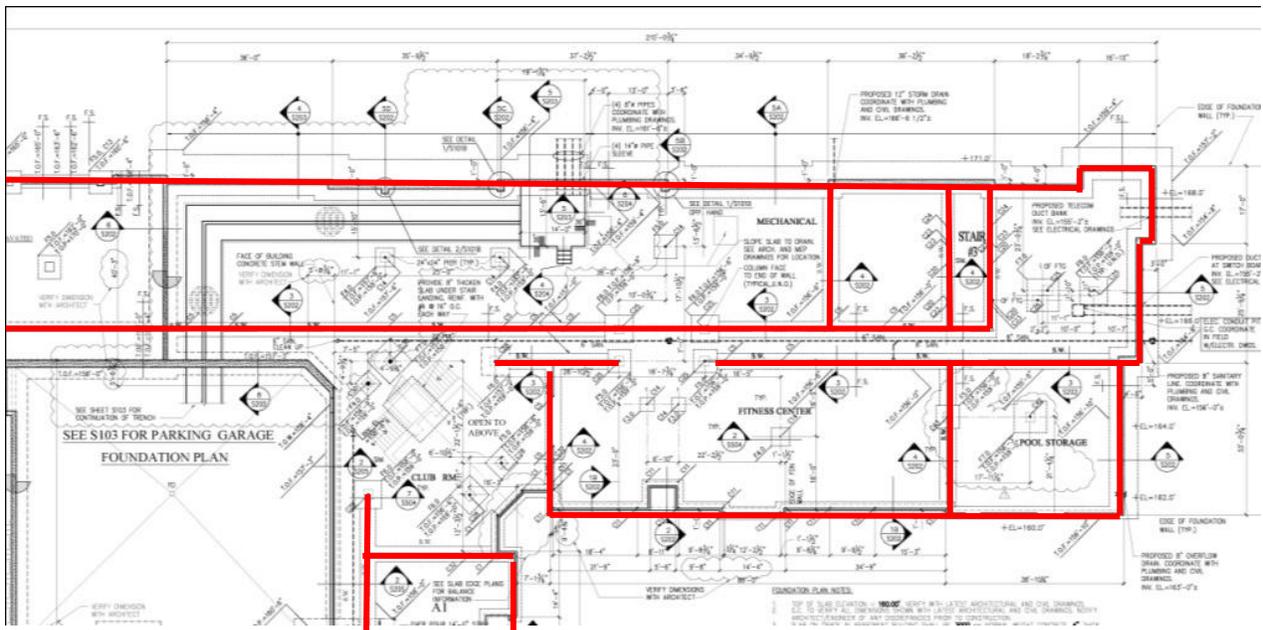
Foundation plan, part of the east wing. (Construction documents by Cates Engineering).
